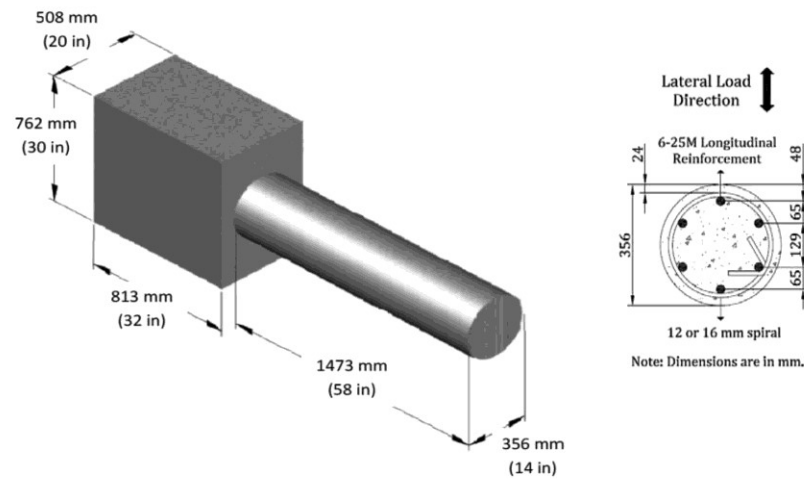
GFRP-reinforced circular concrete column details (Tavassoli et al. 2015)
